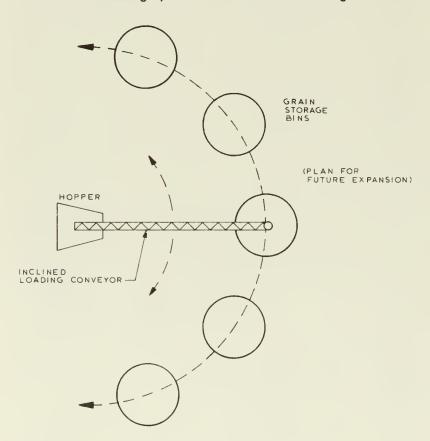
Plan for multiple use of equipment and future expansion
